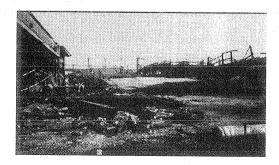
Damage occurred in The Railway Car Factory of TCDD with steel frame in Adapazarı
